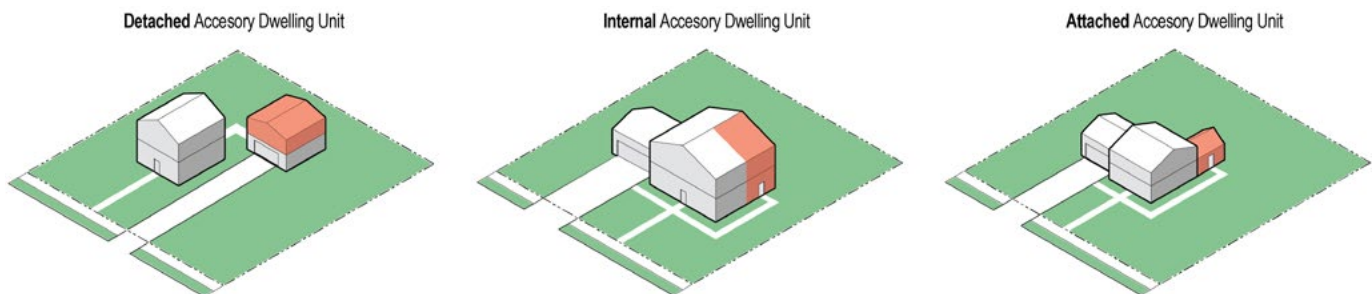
Examples of accessory dwelling unit types (Prepared by Houseal Lavigne)
